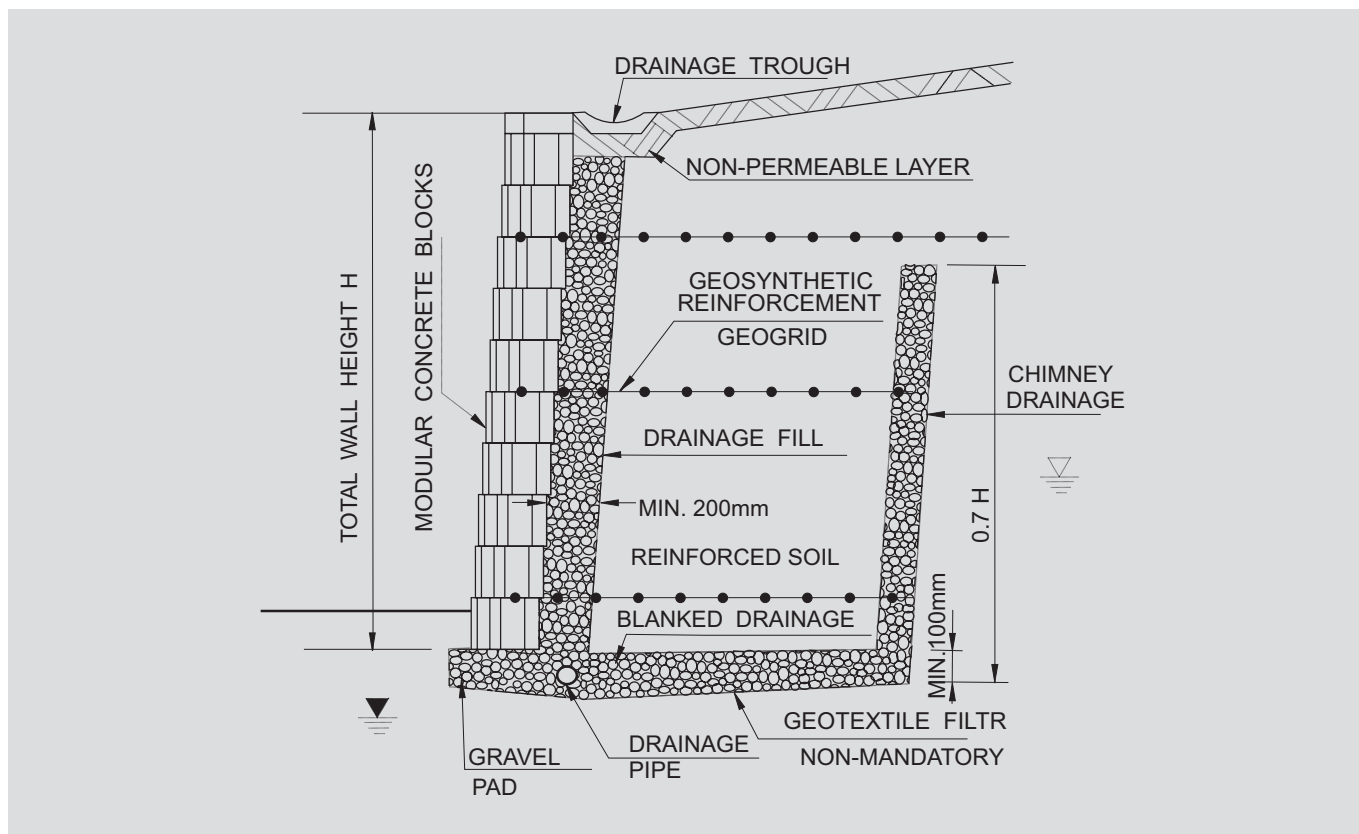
Typical section view of a retaining wall with blanket drainage and chimney drainage
